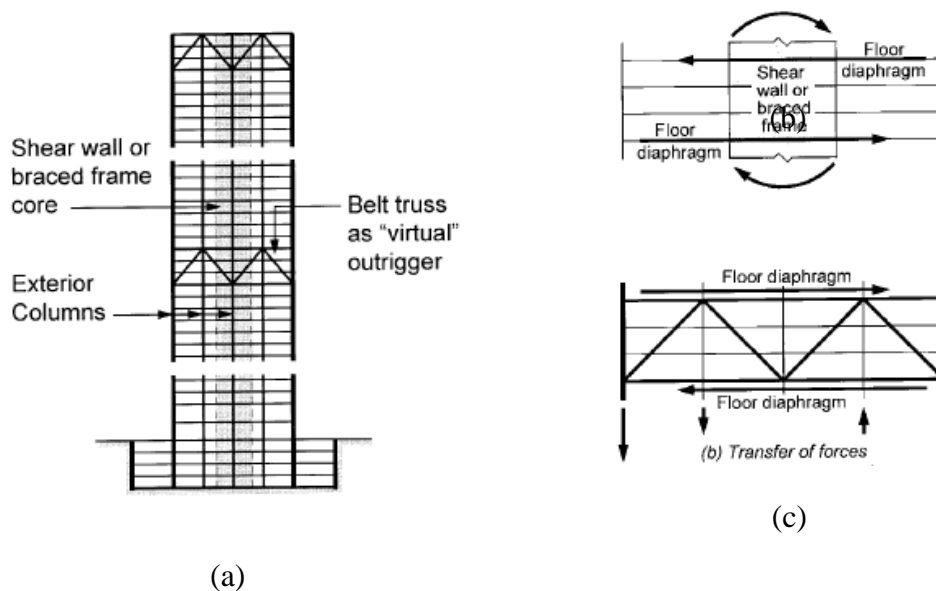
(a) Tall building with Virtual Outriggers (b) Force transfer from core to floor diaphragms (c) Force transfer from floor diaphragms to columns
